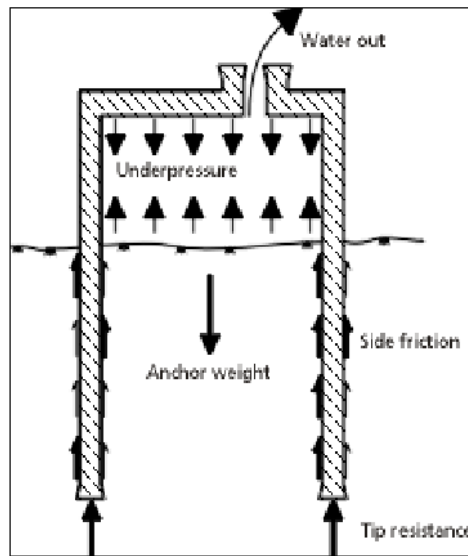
Suction caisson with forces acting during penetration (Andersen and Jostad 1999).
